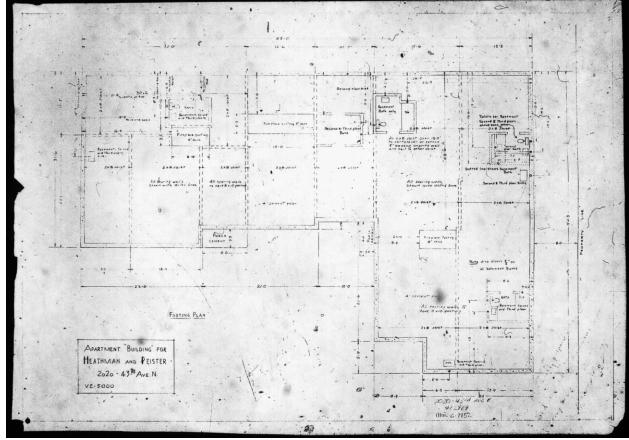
"Apartment Building for Heathman and Peister 2020 43rd Ave. N. [Building Permit] 412969 Mar. 6 1952" Footing Plan
